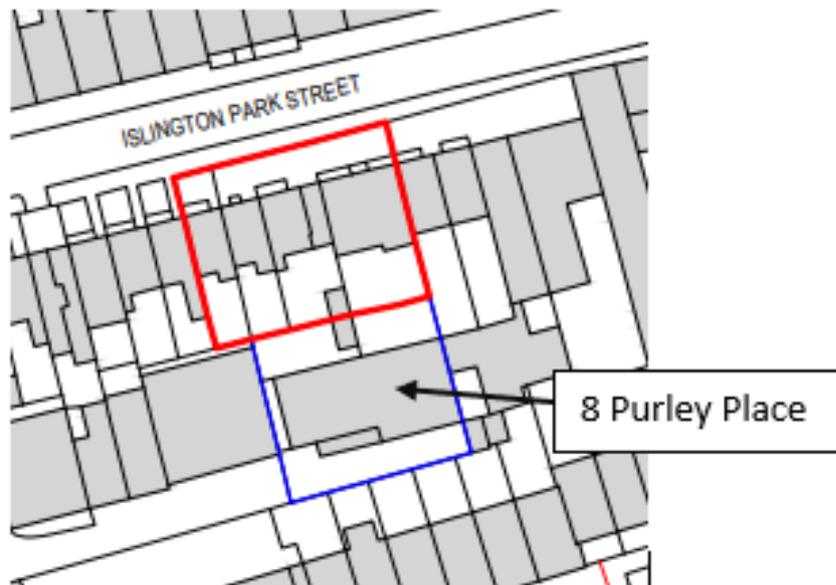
Site Location Plan showing site in proximity to no. 8 Purley Place
